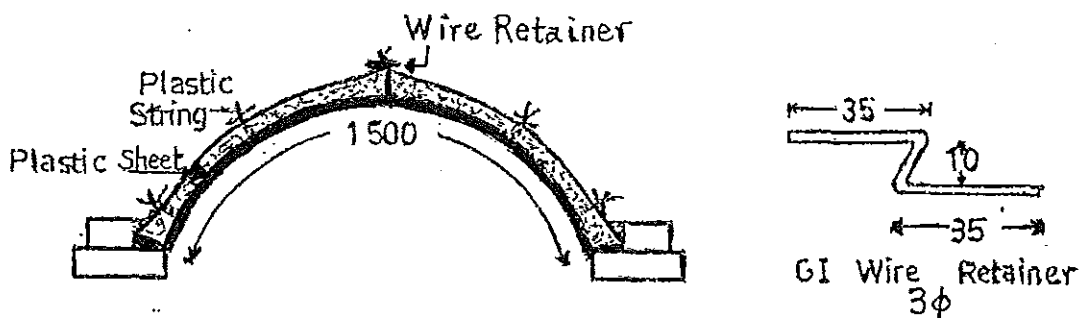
Use of Tying Strings to Hold Plastic Sheet in Place
